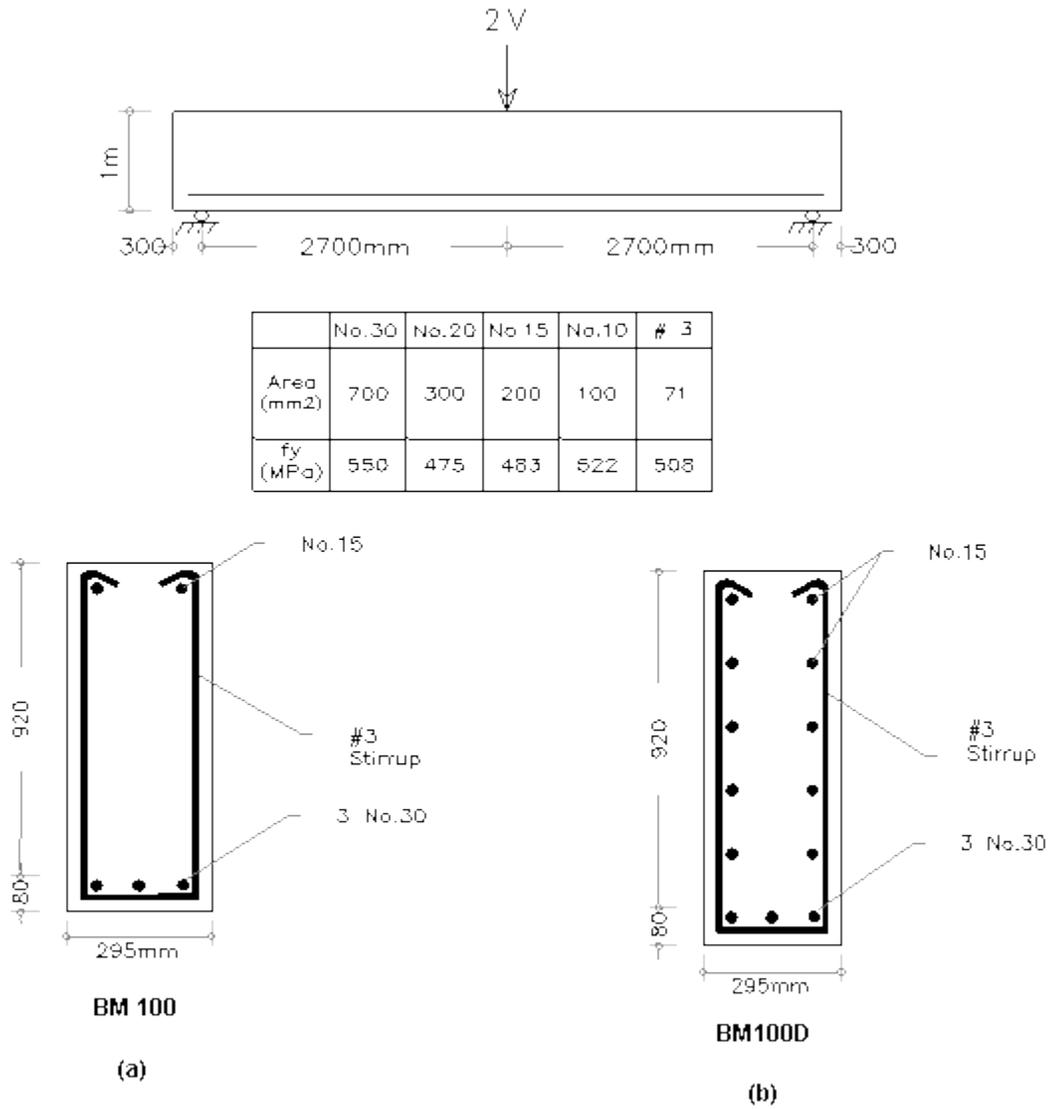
(a) Cross-section of normal strength, non-prestressed simply supported reinforced concrete beam (b) Cross-section with the crack control (skin) reinforcement.
